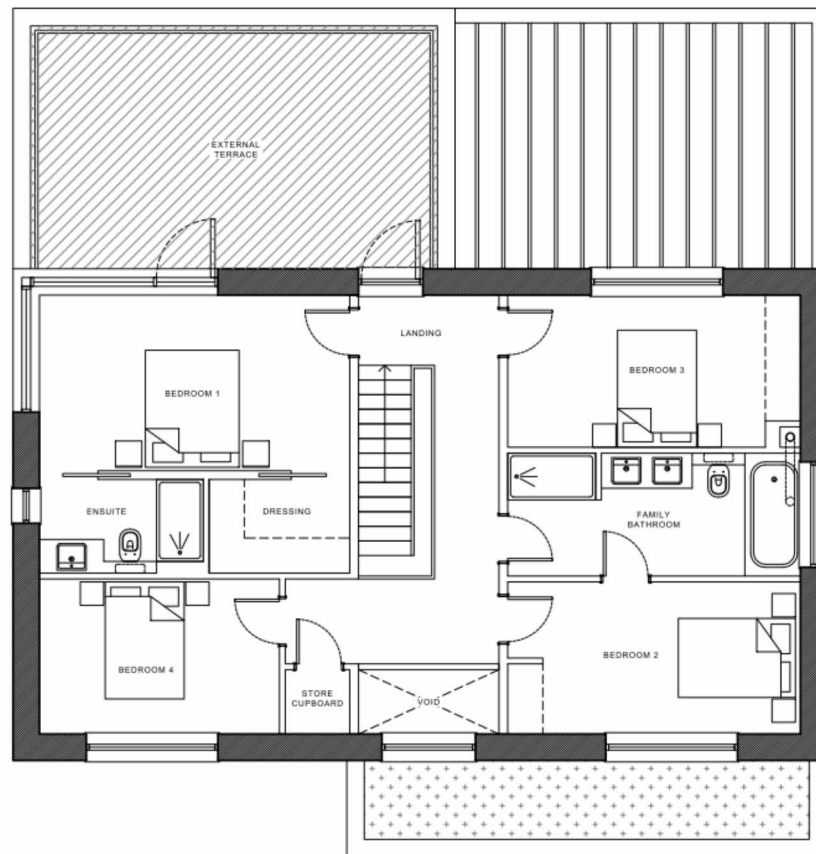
First Floor Layout (Courtesy of Angus Meek Architects, 2024)
